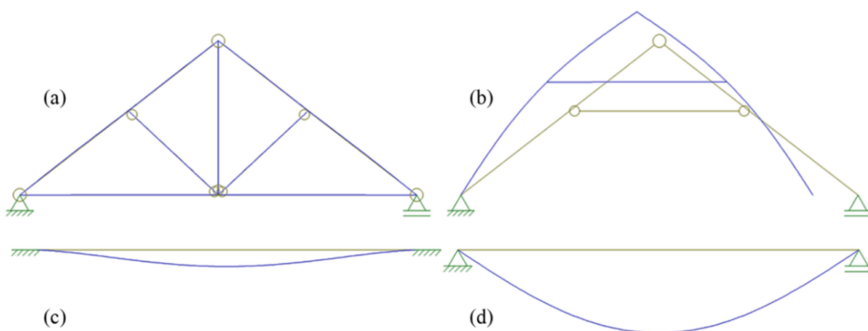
Constructive evolution of the wooden structure: roof structure before (a) and after (b) the restoration of 1970, slab wooden beam before (c) and after (d) the restoration of 1970
